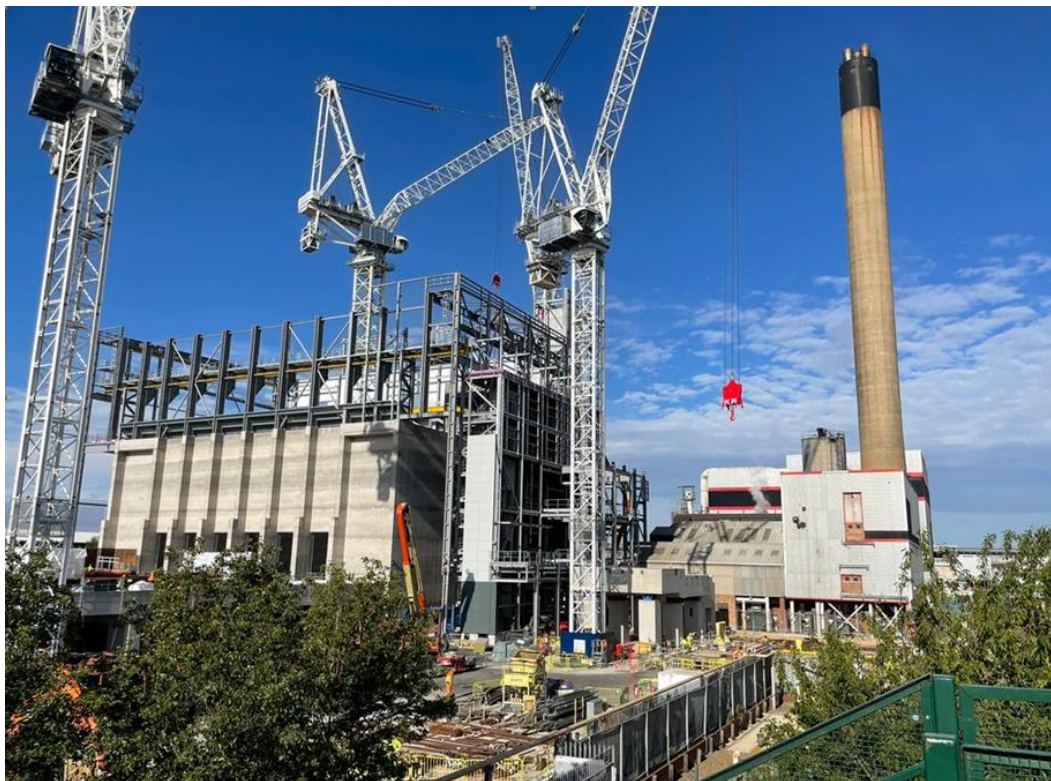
Tipping Hall Construction Area, Consented Development Construction Works (August 2022)
